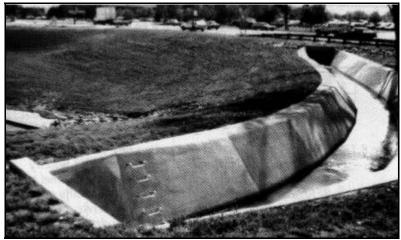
Channel with Concrete Lining (Source: ASCE Urban Stormwater Manual)
